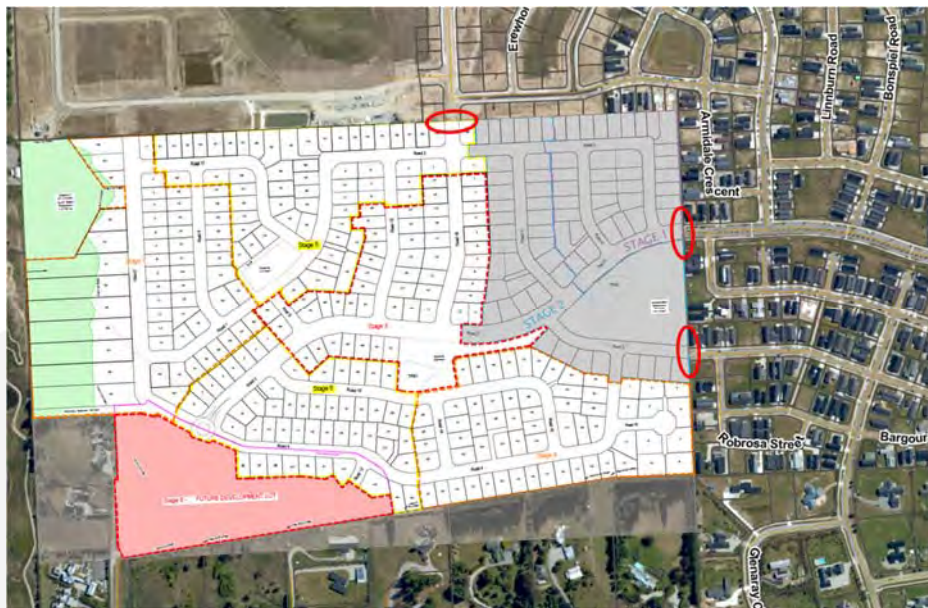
WFH Site in Context of Northlake Roading Network with External Linkages Highlighted
